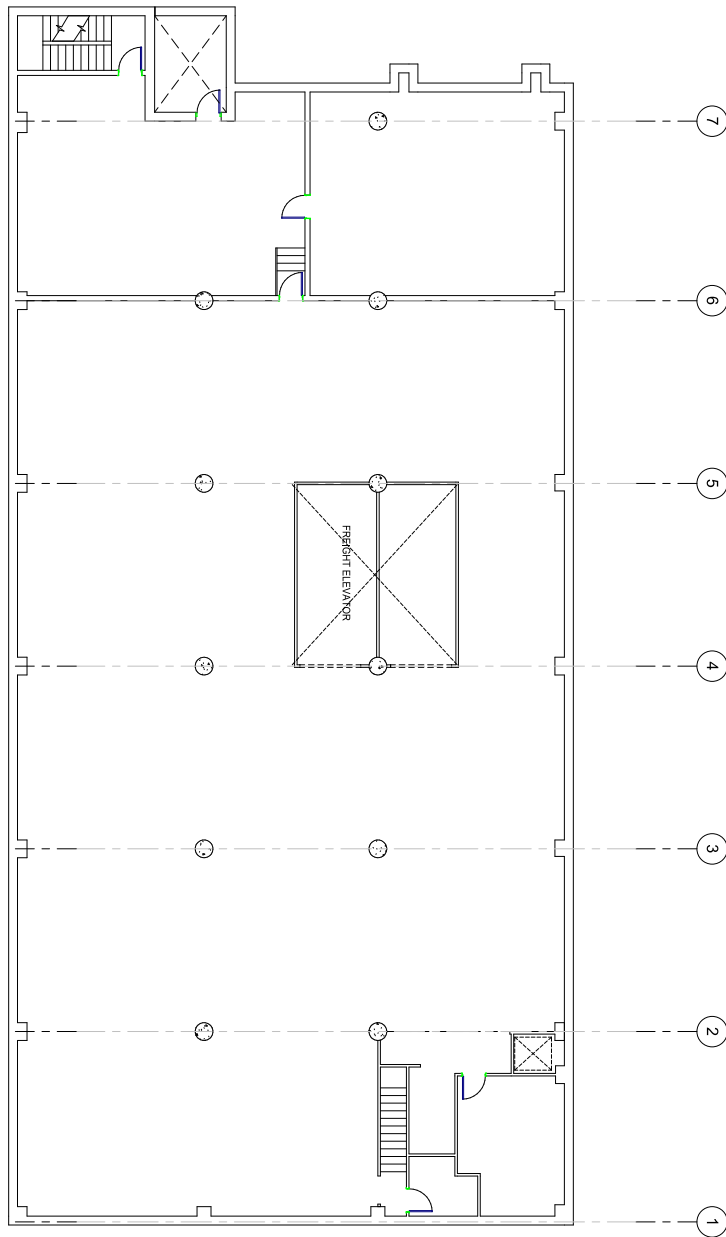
As-Built Basement Floor Plan. (WILDESIGN Architects, 2018)
